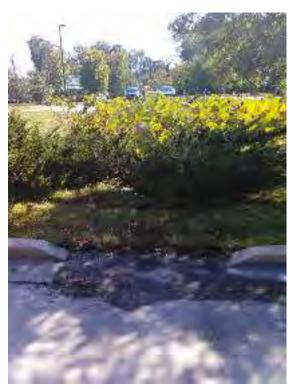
curb cut draining rear driveway pad. Drains to western pond.
